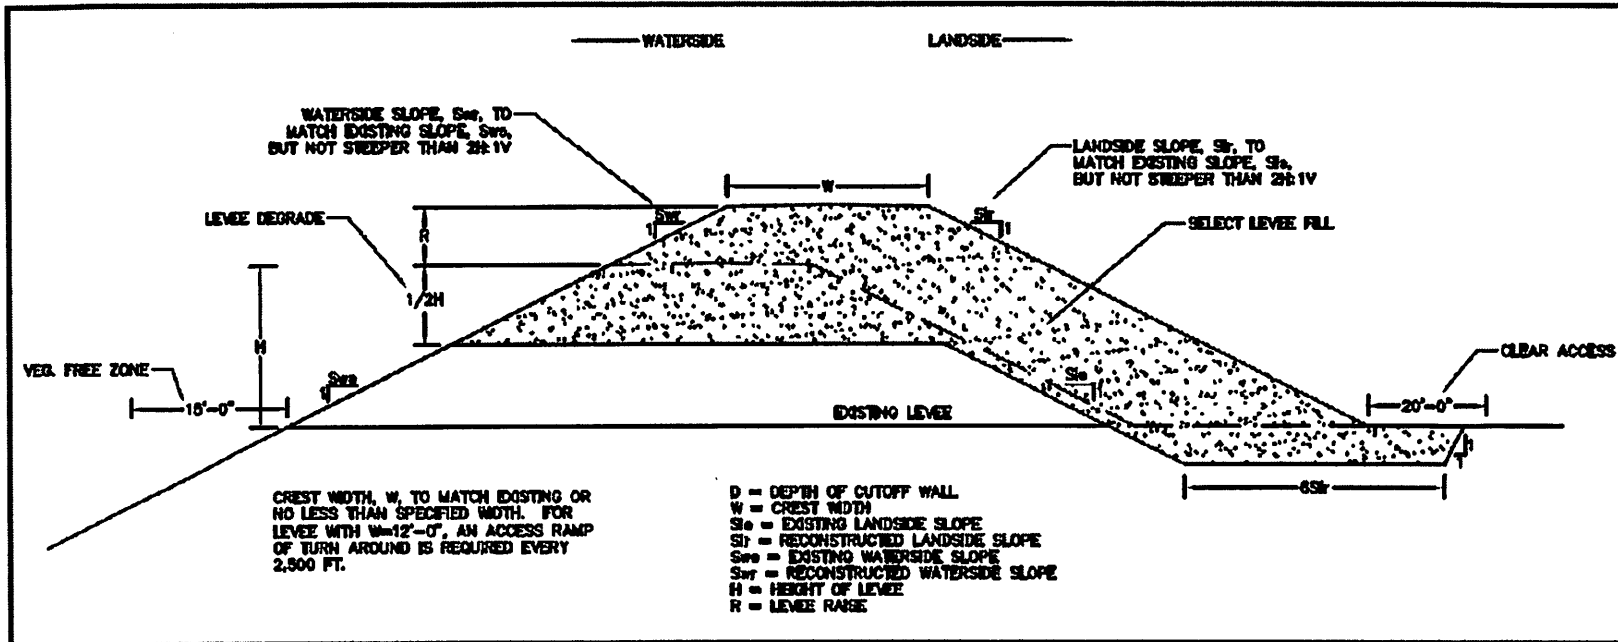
Levee Reshaping and Levee Raise Typical Plan.
